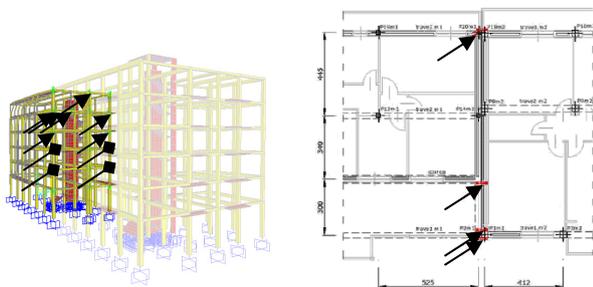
Positions of the FV devices in elevation and on the fifth story plan.
